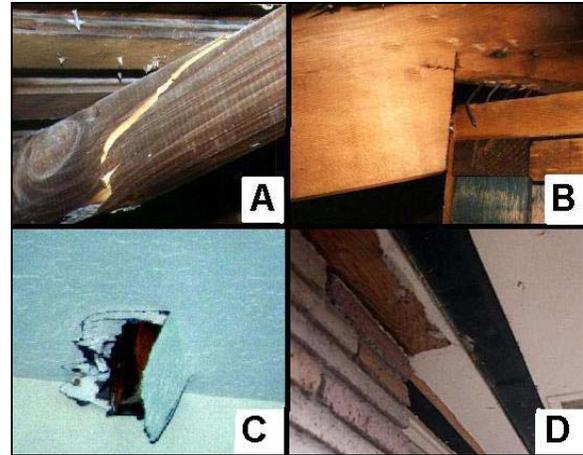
Additional examples of wind damage to a roof structure: A) fractured rafter, B) uplift of rafter from the top plate, C) brace penetrated ceiling, and D) outward movement of soffit when tree impacted roof.
